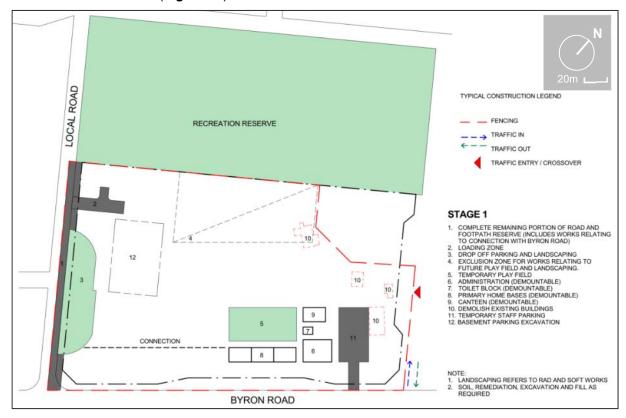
| Proposed Stage 1 showing internal connections and roadworks (Source: Applicant's EIS 2019)
